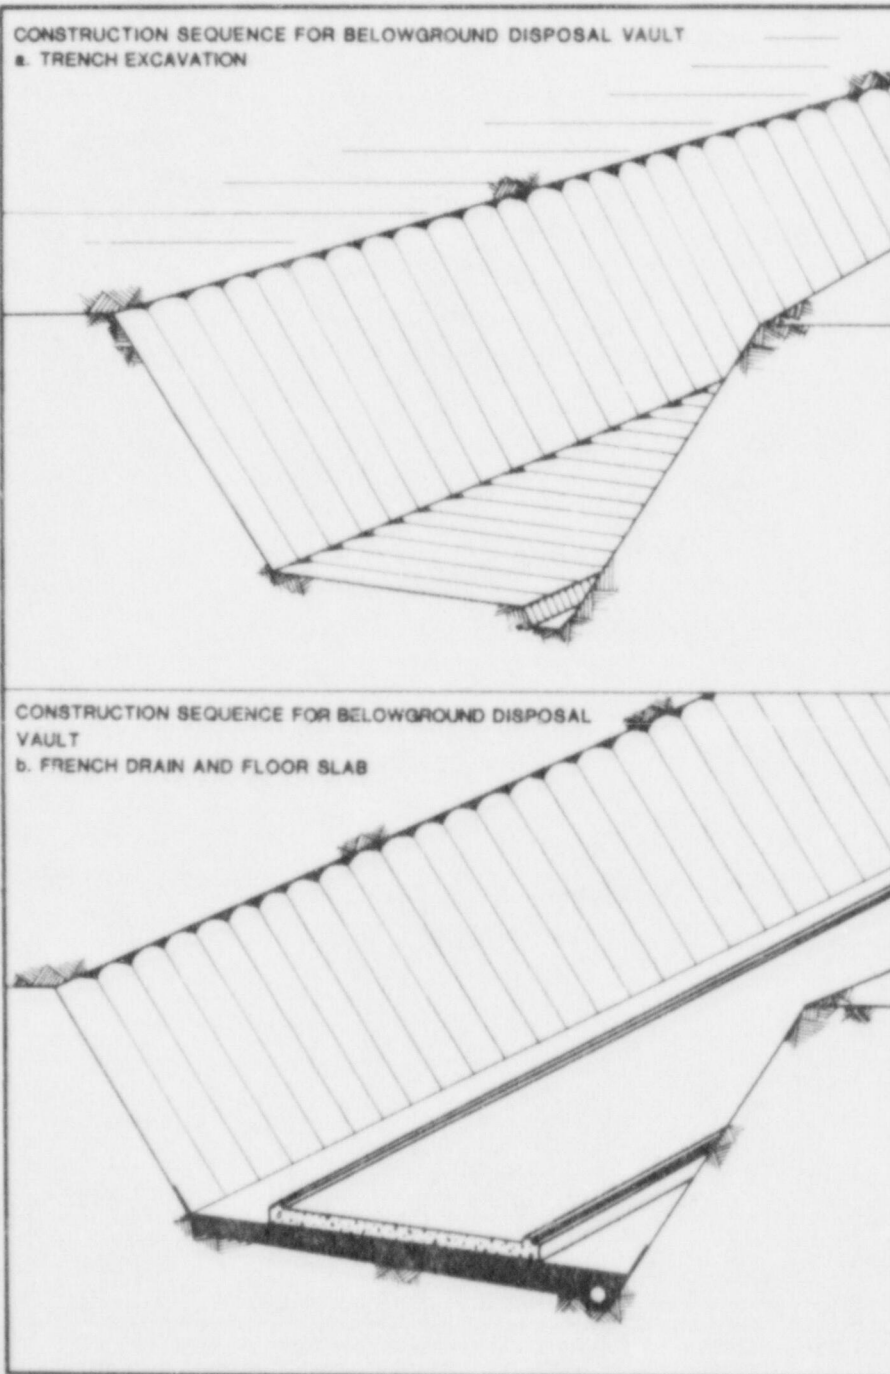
Construction sequence for cut and cover construction of belowground vault LLW disposal units. Figure 5a. shows the initial excavation. Figure 5b shows the underdrainage system and floor slab in place.
